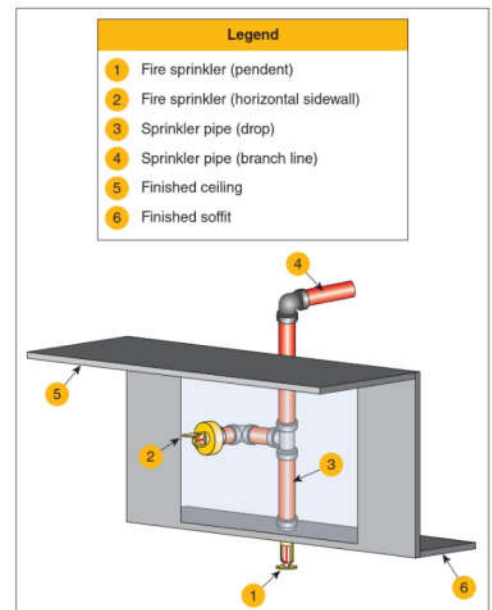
Location Sidewalls with Respect to Soffits — Sidewall Under Soffit.
